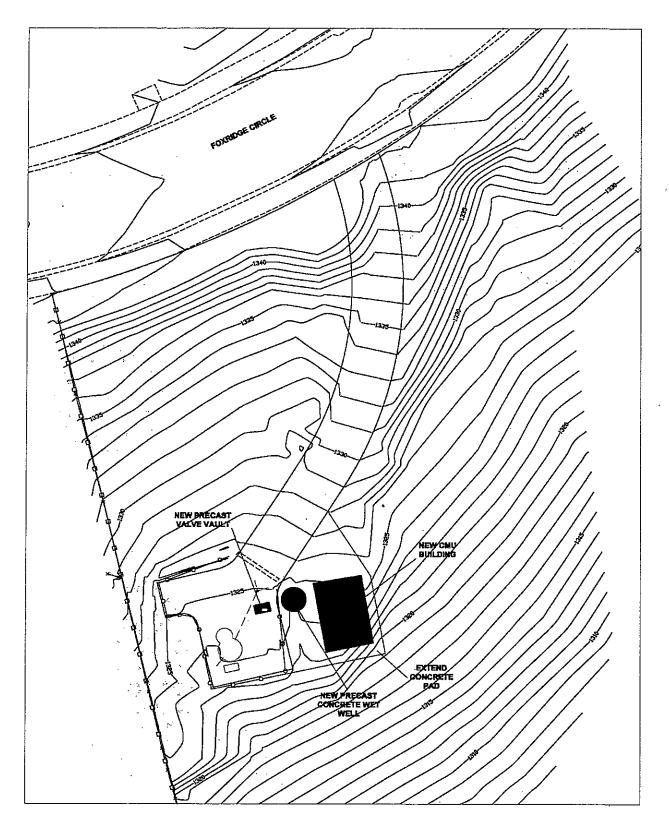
General Layout of the Upgraded Auburn Oaks Lift Station
